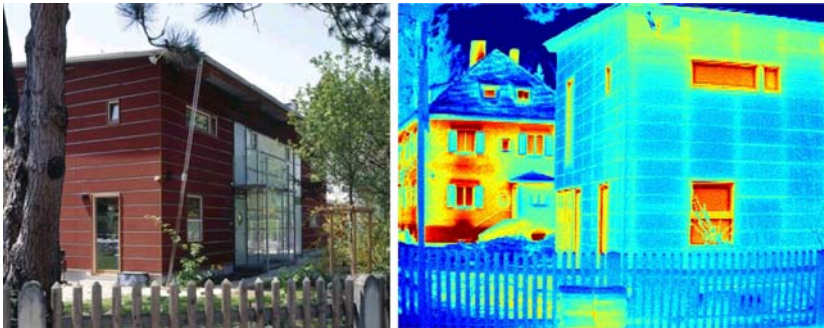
Photograph (left) of the new ultra-low energy timber building and the infrared image (right) of the VIP insulated building envelope (architect: F. Lichtblau/Munich, Germany).
